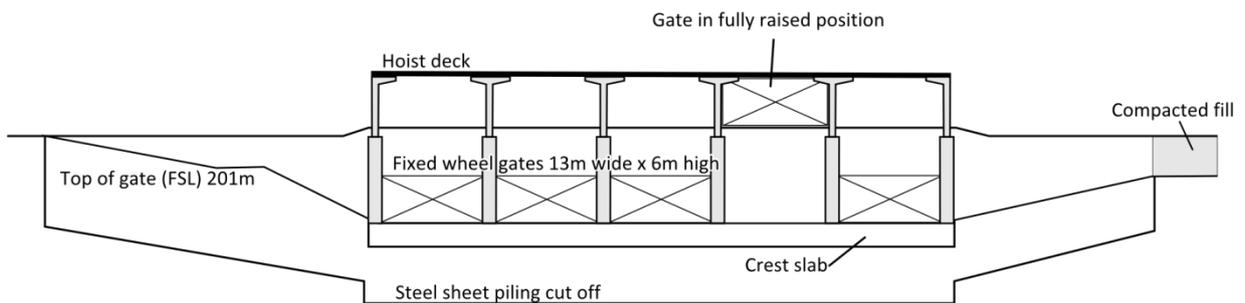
Proposed structural arrangement diagrams for the potential O'Connell Creek offshore storage
